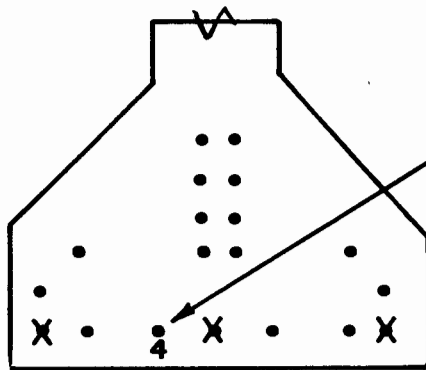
Location of fatigue fractures for Specimen C-16-UP-8.0-NO-1.73
